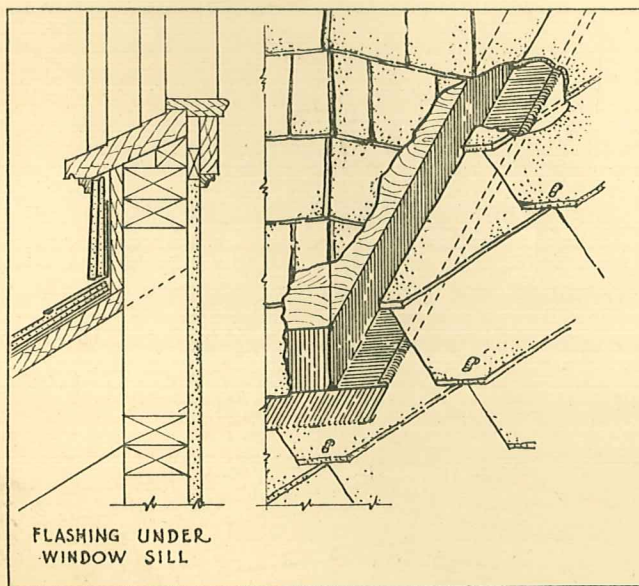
Flashing around lower corner of dormer—showing flashing under sill
